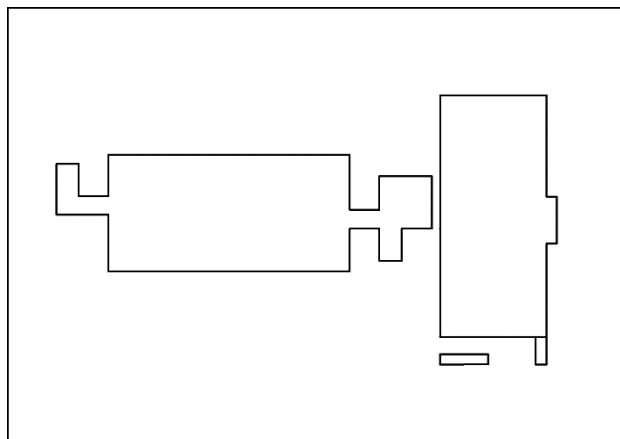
Example of a floor plan of a Brazilian Youth Prison - Form A
